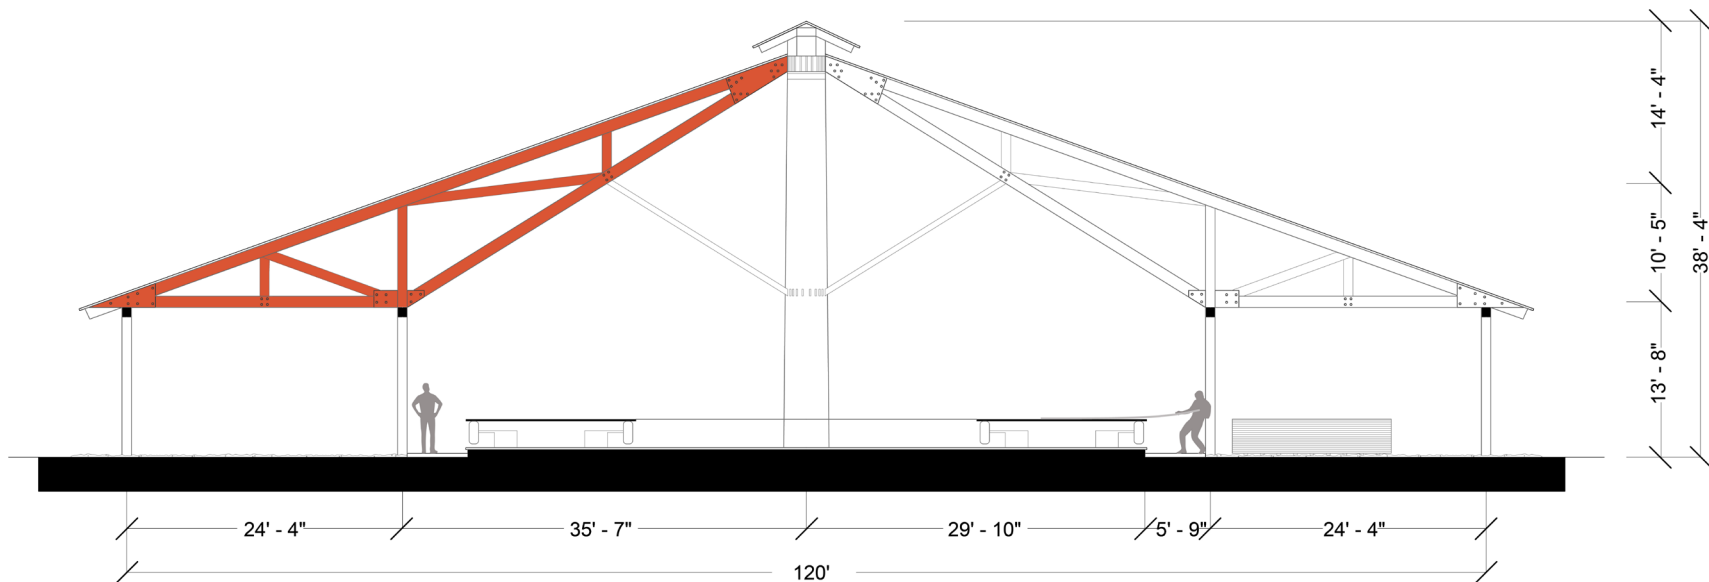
Dimensioned Section of Round Shed with Typ. Truss highlighted.
